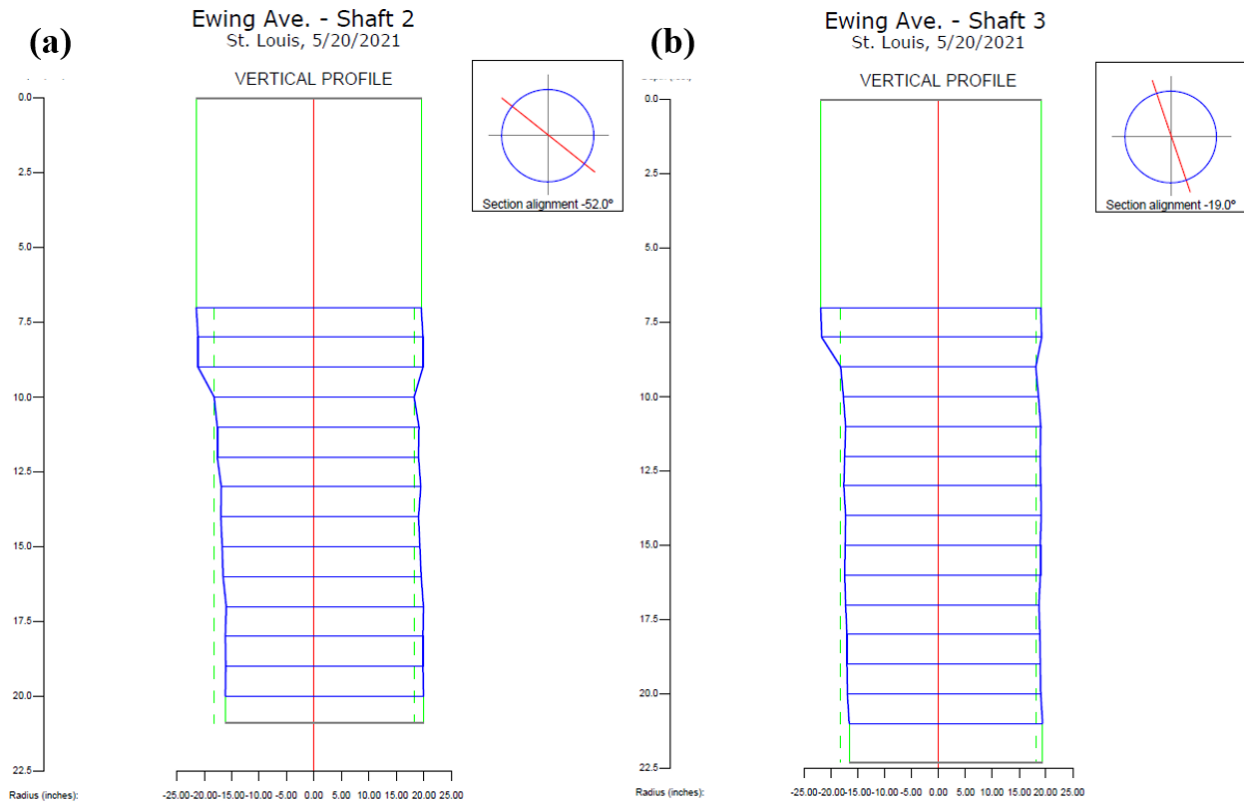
SONICaliper shaft profiles for Ewing Ave.: (a) Shaft 2 and (b) Shaft 3.
